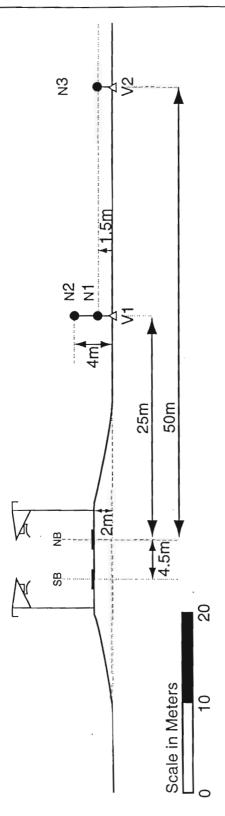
B. CROSS-SECTIONAL VIEW OF FRENCH MEASUREMENT SITE K
